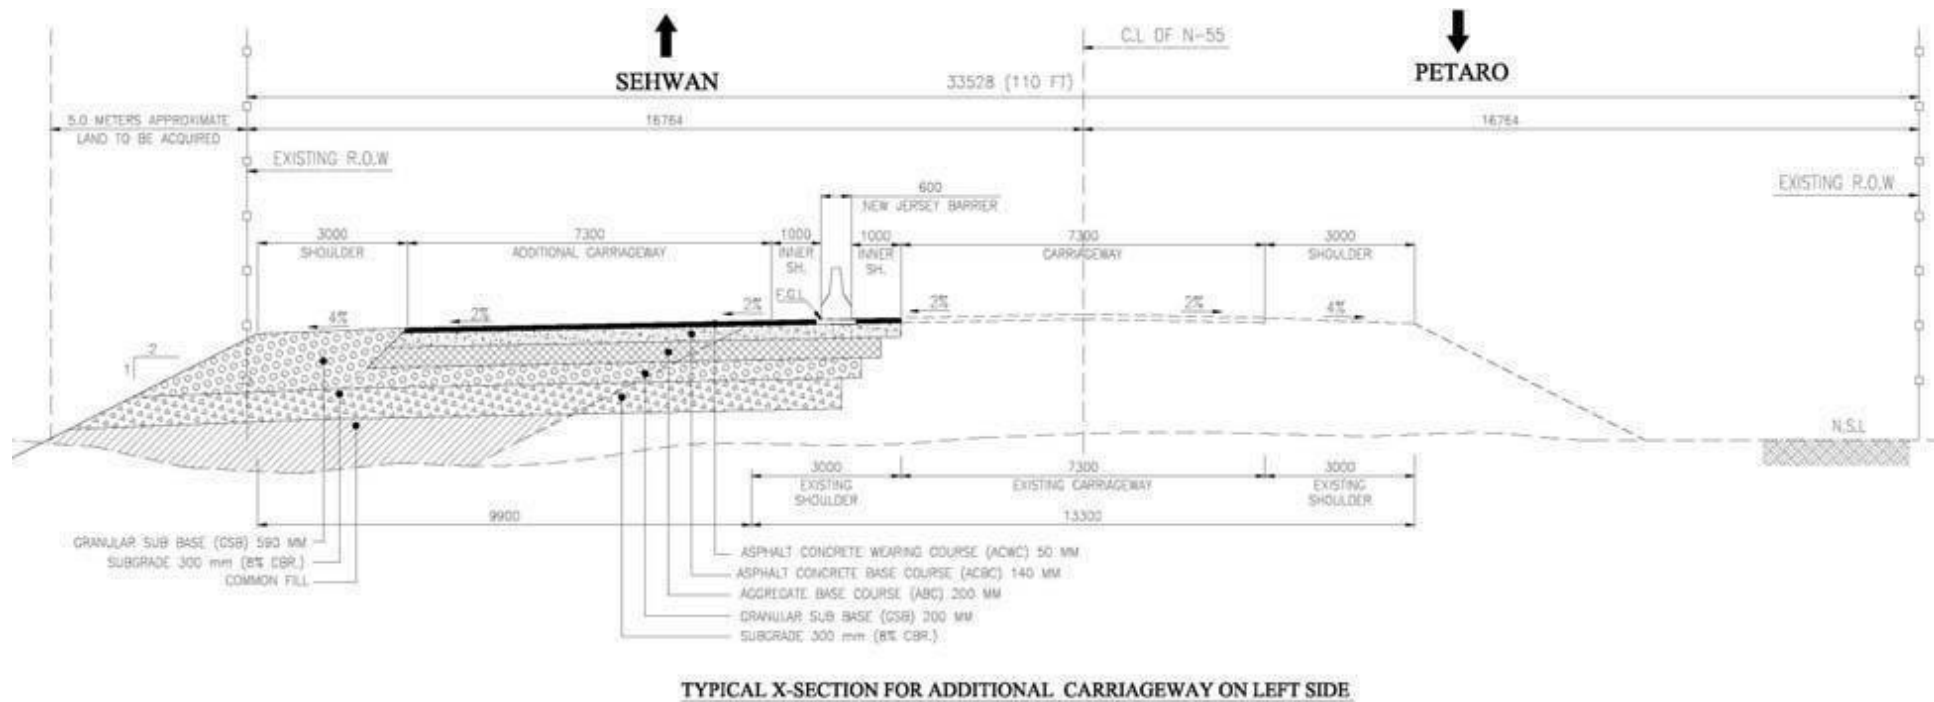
Typical X-section for Additional Carriageway on Left Side
